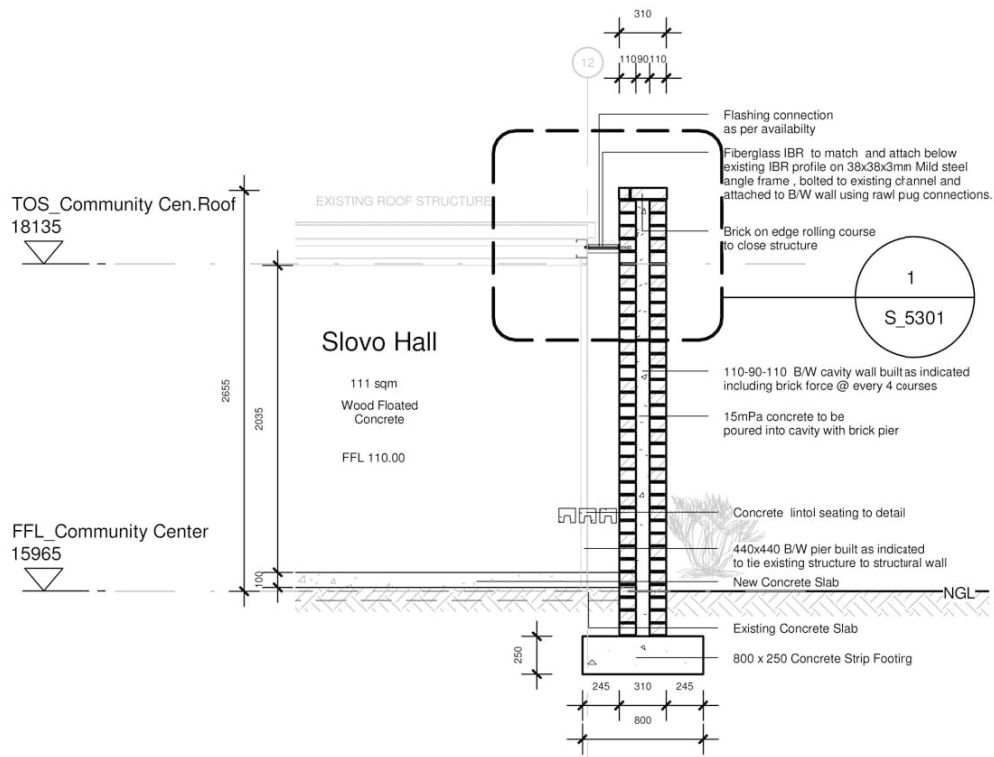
Architectural renditions of proposed upgrade of community hall -detailed section (Bennett 2010)
